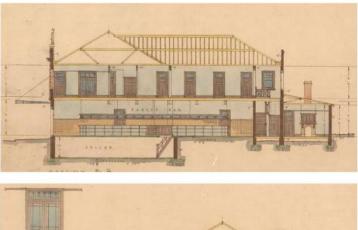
Architects Copeman and Lemont's elevation drawing of the new (and existing) Ashfield Hotel prepared in 1926 for Tooth & Co Ltd
